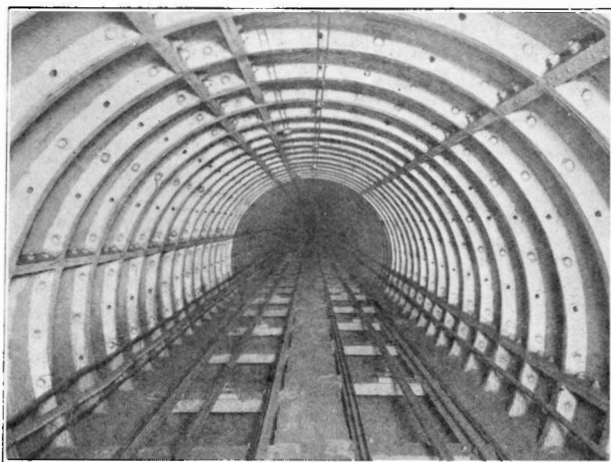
DOUBLE TRACK IN 9 FEET TUNNEL.
